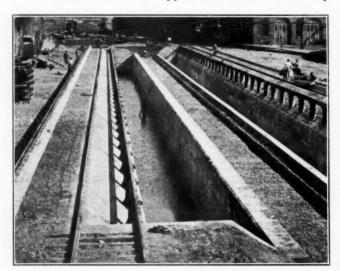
Reinforced Concrete Cinder Pits at Scranton, Pa.
